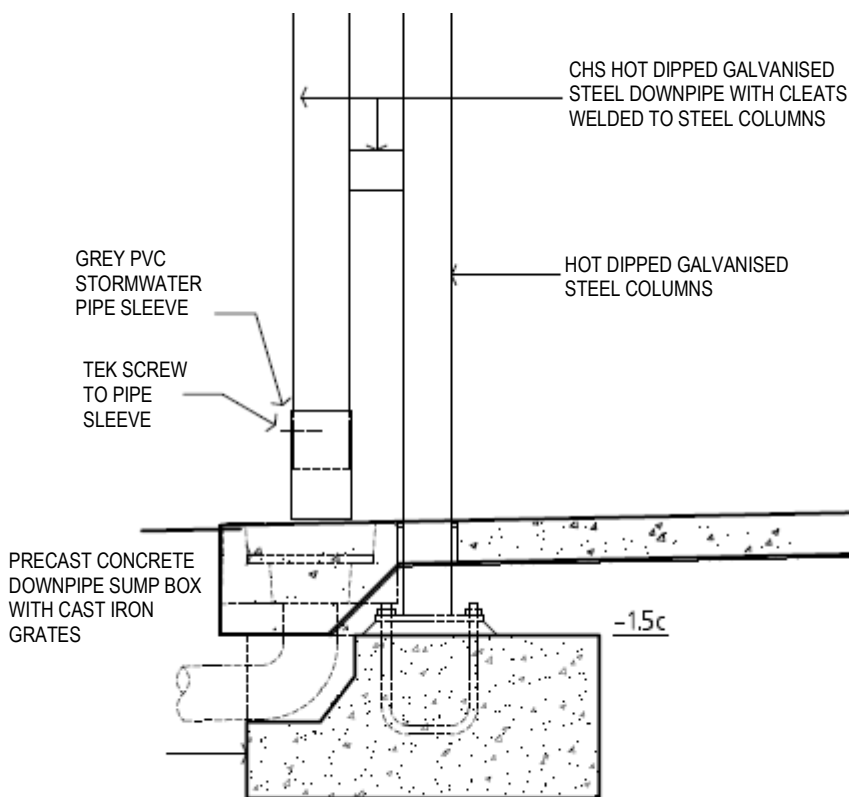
A downpipe detail from the primary school brief that prevents wash to paving and is not a trip hazard.
